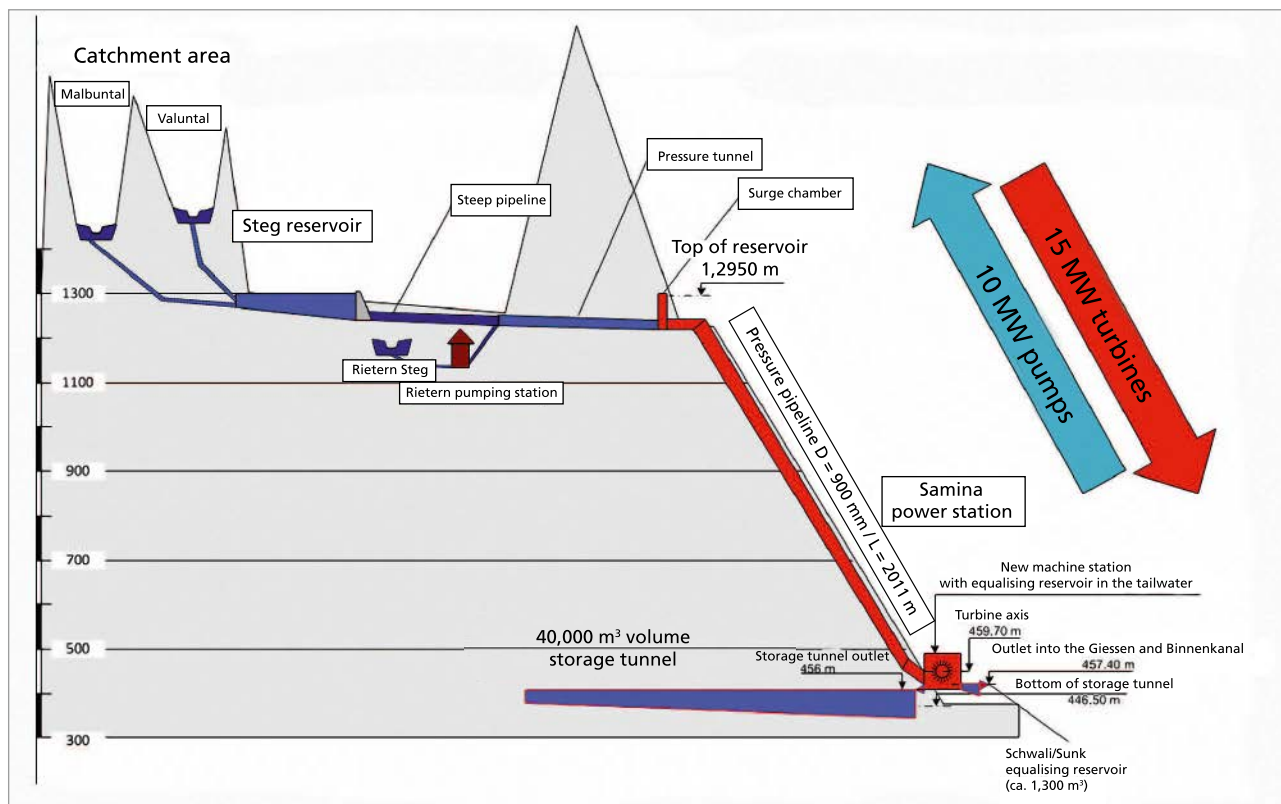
Longitudinal section – Samina pumped storage station in Vaduz
